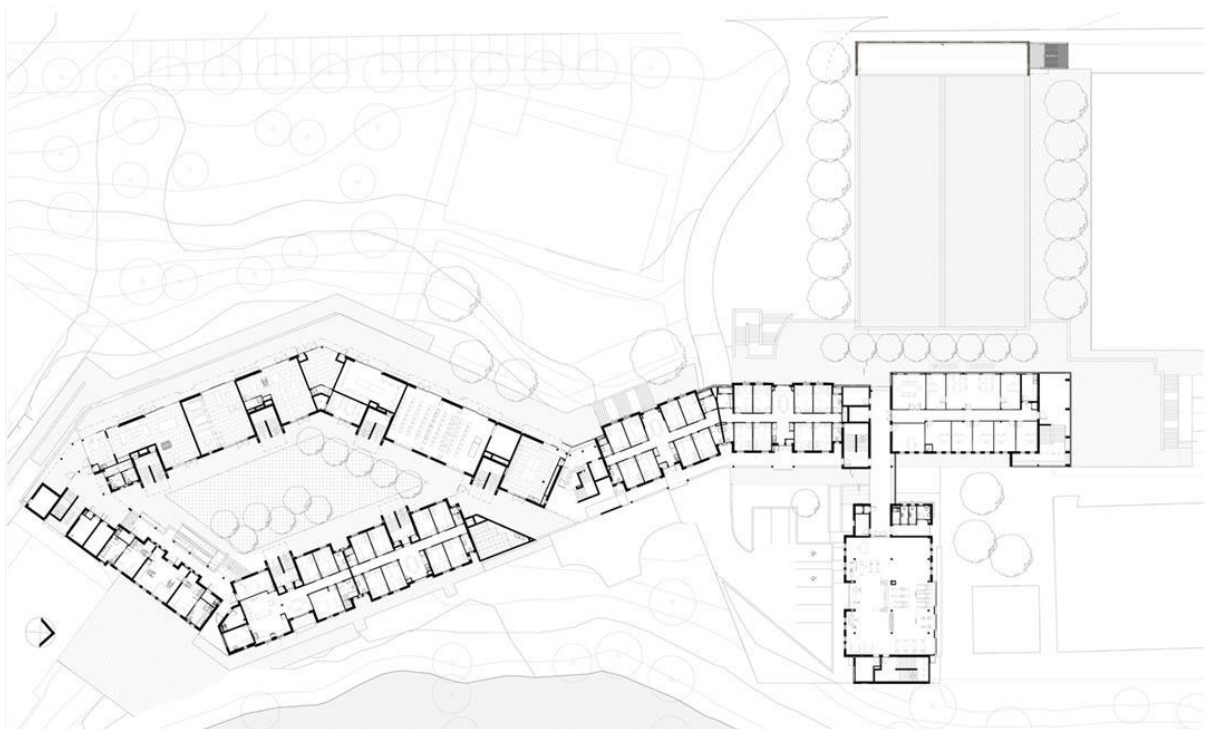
Plan shows the connection between the blocks. Source: ArchDaily.com
